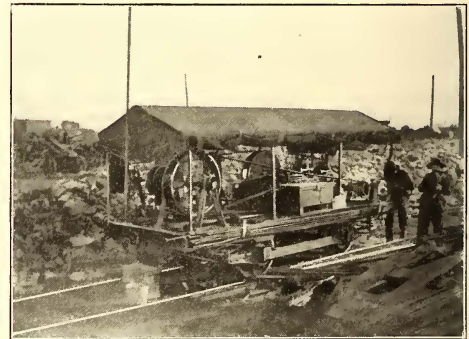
ELECTRICALLY DRIVEN AIR COMPRESSOR USED IN DRILLING RAILS
